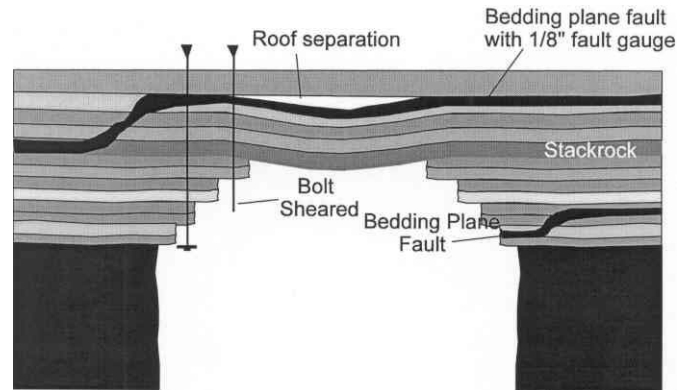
Bedding plane faulting caused by lateral movement of valley floor members due to valley stress relief.
